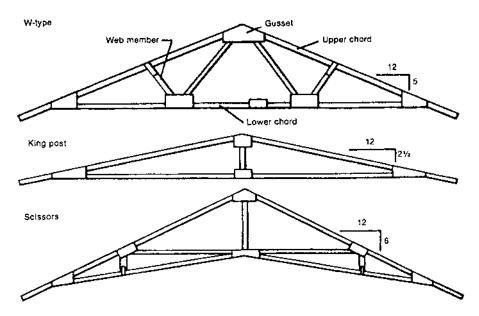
Light wood trusses. (From Jackson, 1987.)
